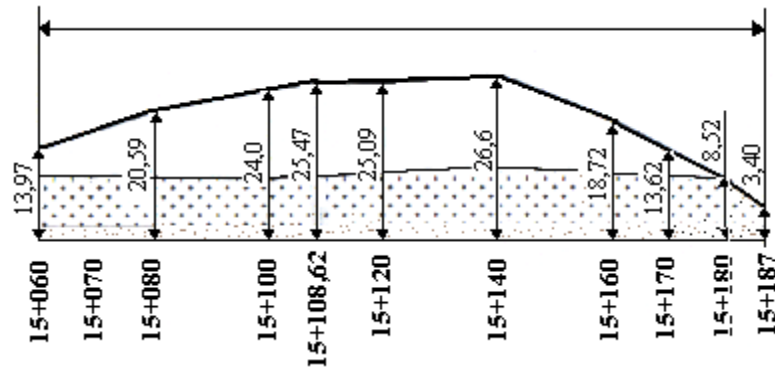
Excavations in North Slopes between KM 15+060 – KM 15+187 [21]
